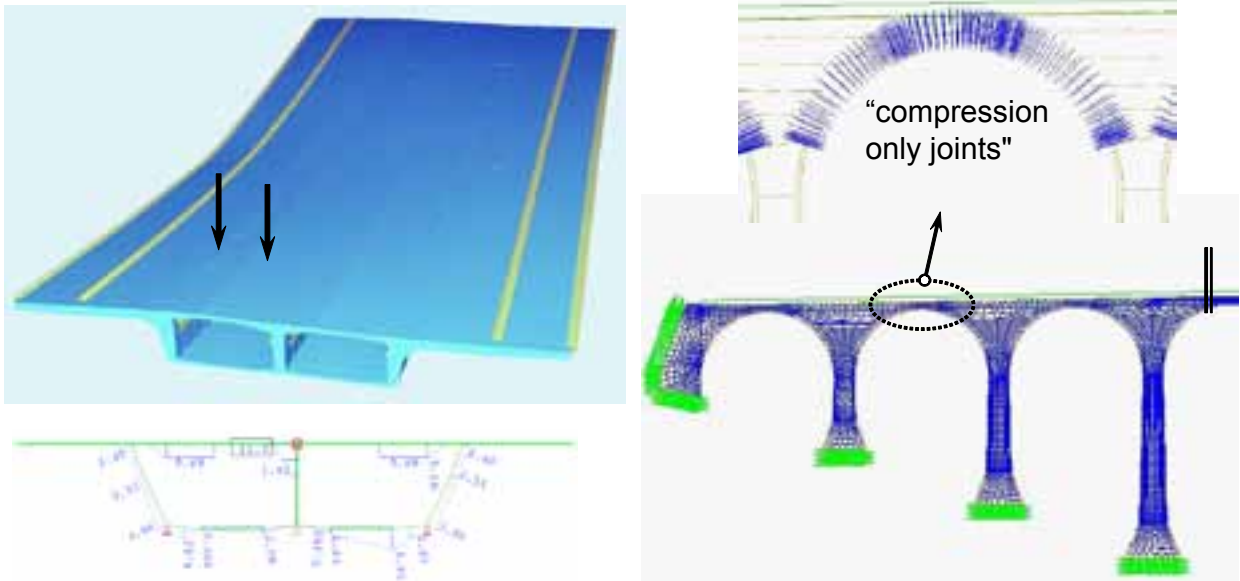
Recalculations of concrete and masonry bridges using 3D shell idealizations and nonlinear material modeling
